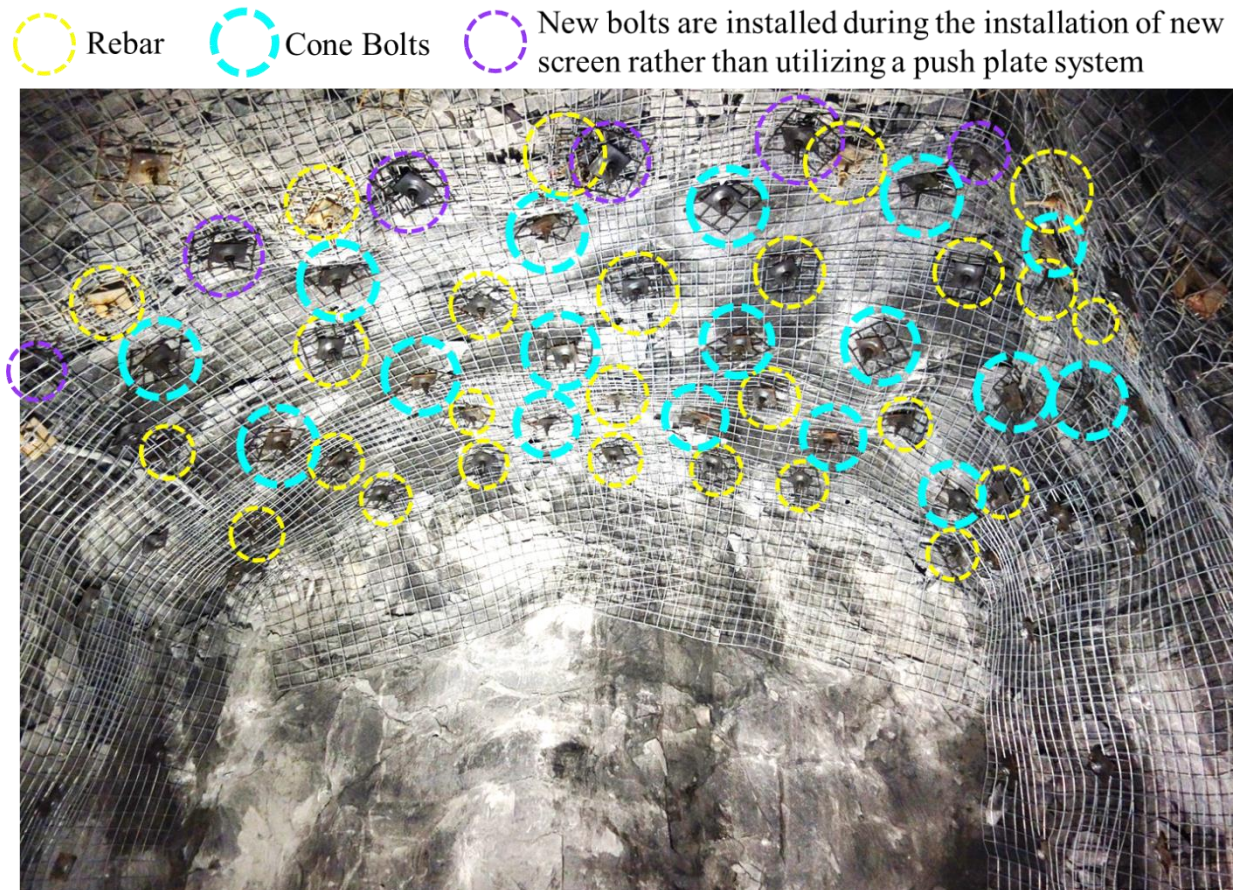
Typical “3-2-3” or “dice” bolt installation patterns through #4 gauge screen at Mine C, Split Sets are installed in the walls
